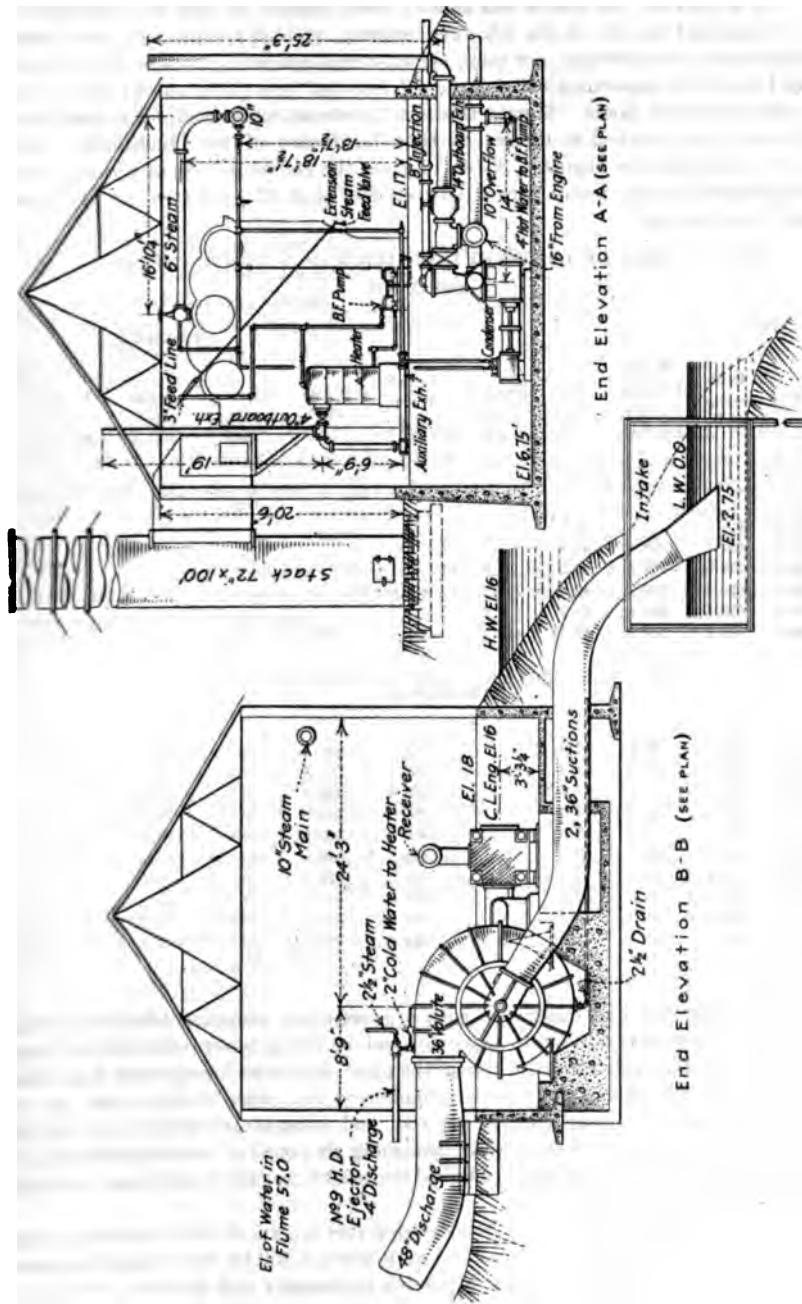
ELEVATION, MOORE'S BLUFF PLANT
